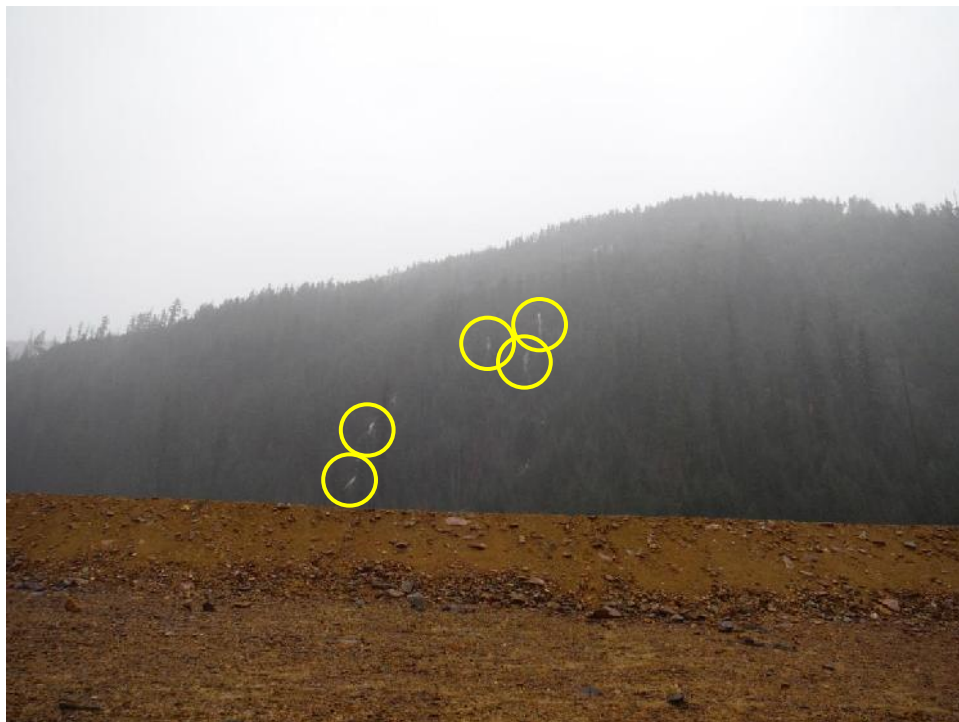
Active springs and waterfalls up in the hill behind the APA, looking north from the East Strip (photo taken on 2014-11-27).
